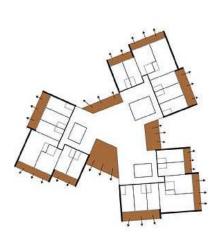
(left): Plan of the three rotated towers and balconies (Retrieved from: https://www.cfmoller.com/p/Campus-Hall-University-of-Southern-Denmark-i2971.html) Figure 3.14 (right): Photo of balcony with natural light and view (Retrieved from: https://www.archdaily.com/785806/student-housing-cf-moller?ad_medium=gallery)
